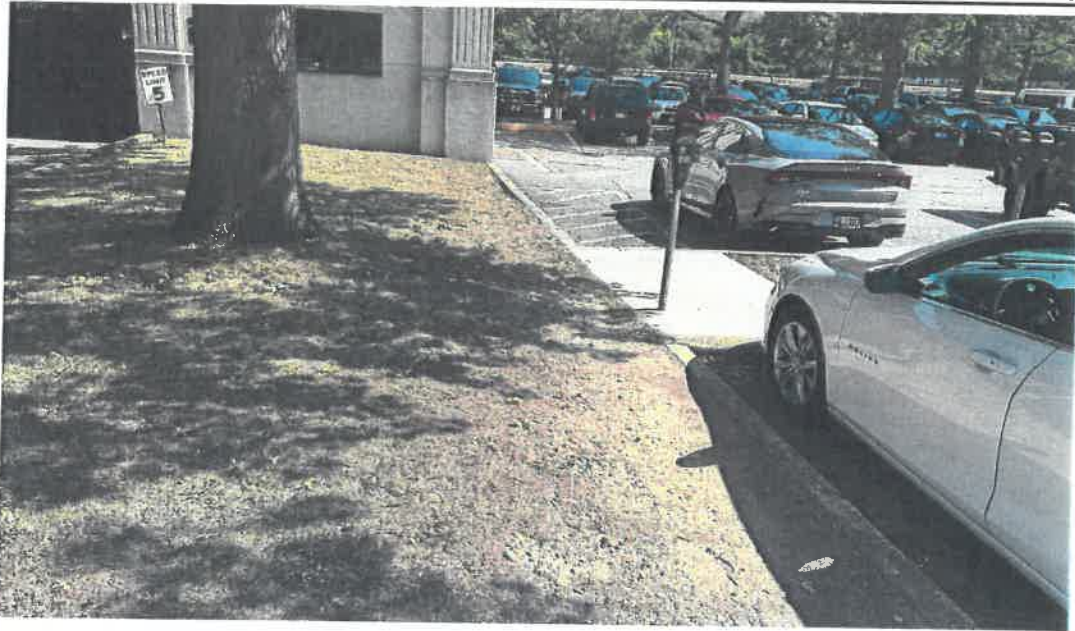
LOT CROSSOVER ADDITION NEAR SOUTH PARKING GARAGE ENTRANCE
